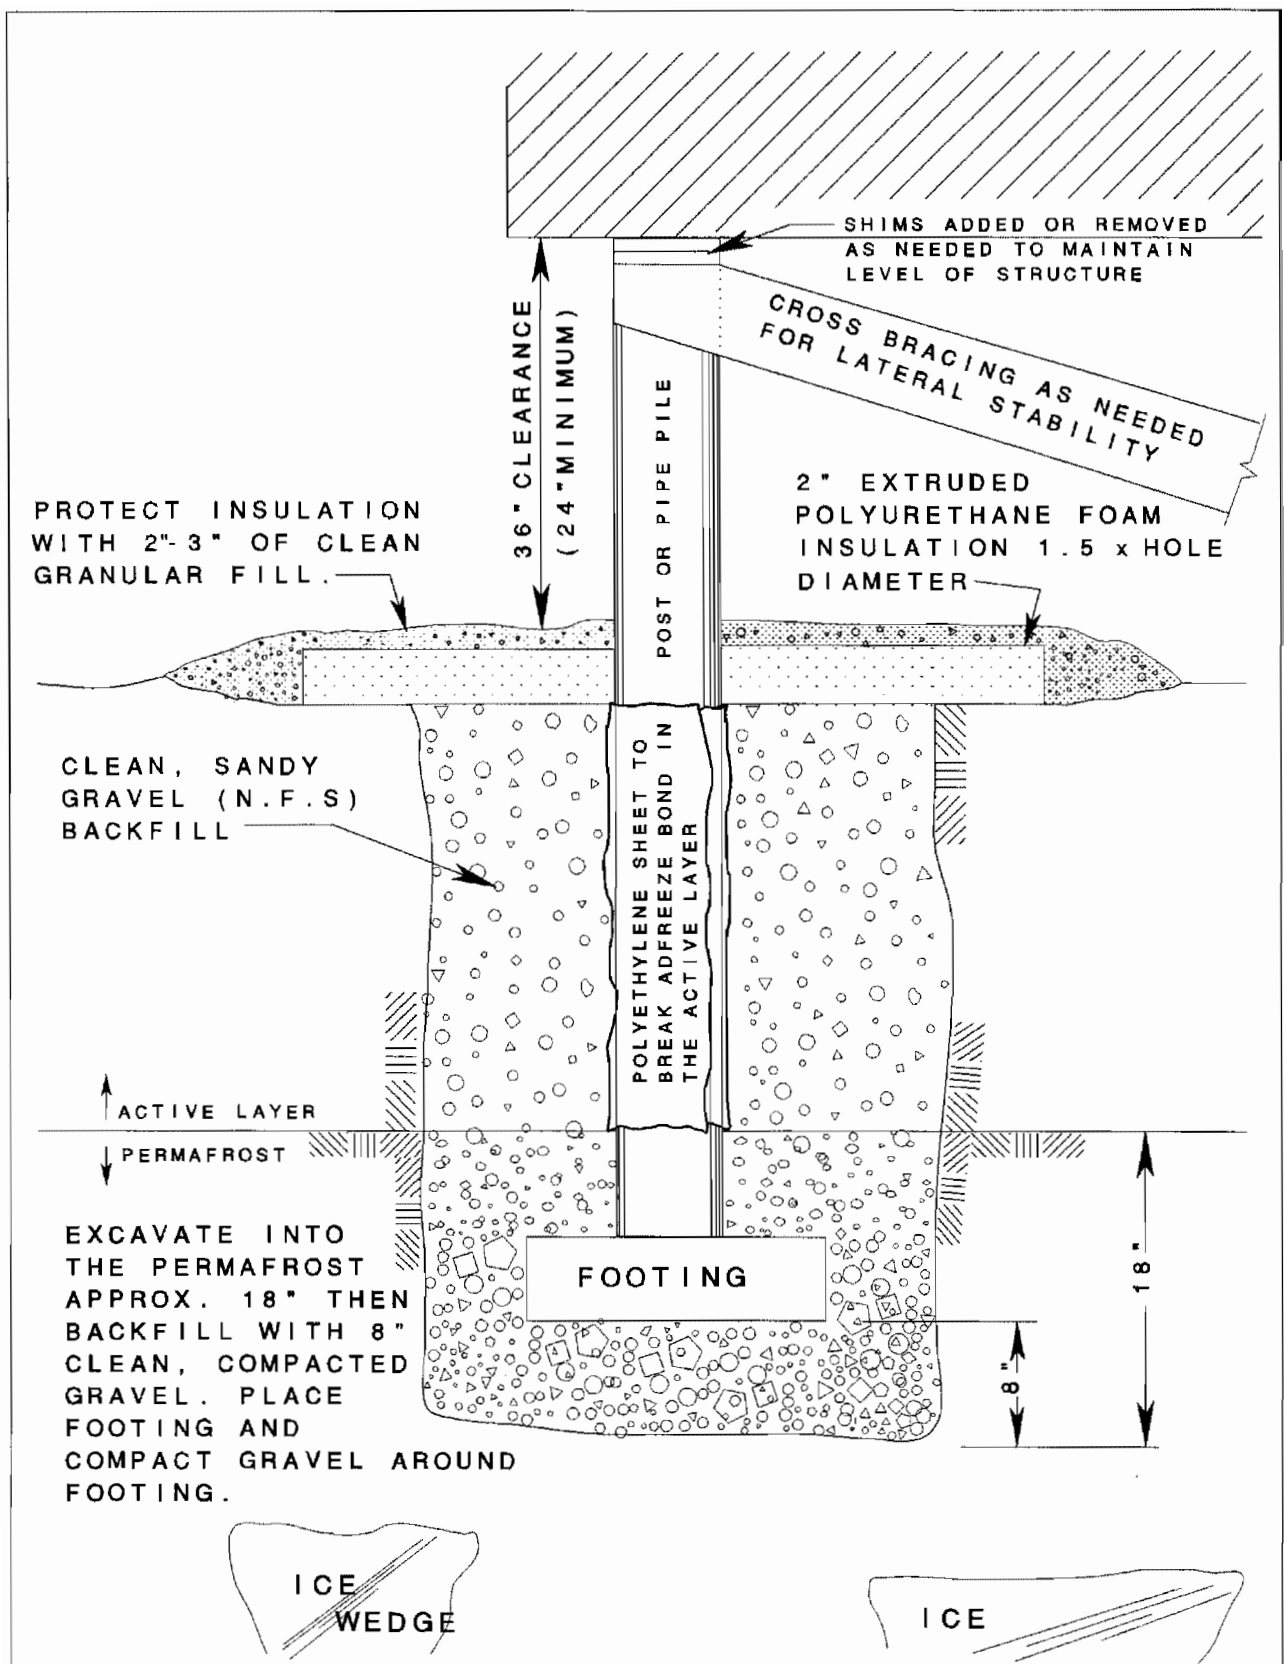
Shallow foundation not anchored in the permafrost. Note: This type of foundation requires periodic releaving, see text.
